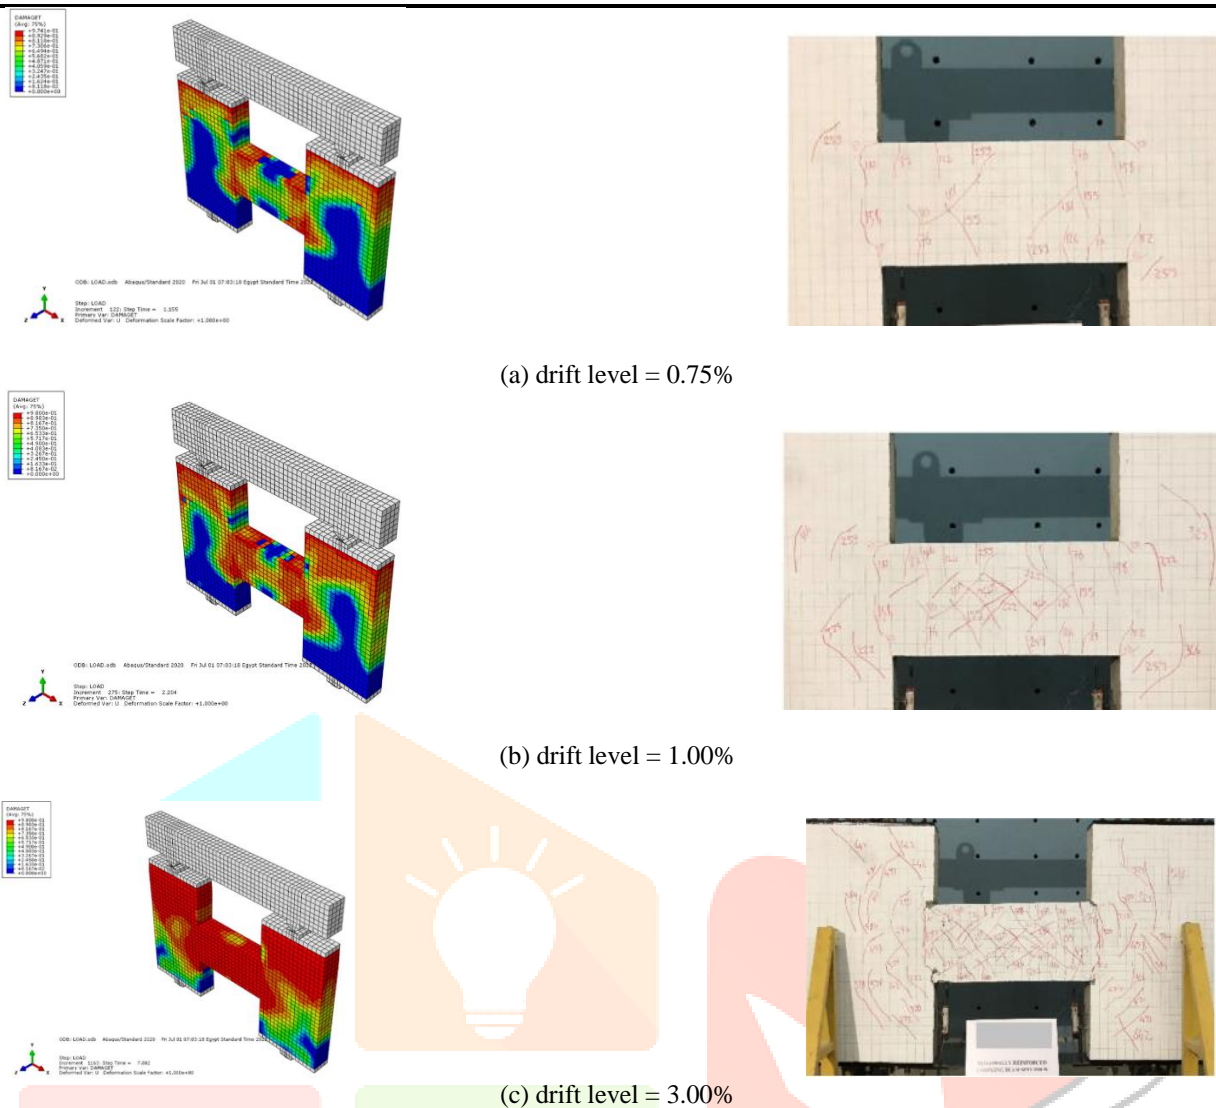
Crack propagation and failure modes for the DRCB specimen
